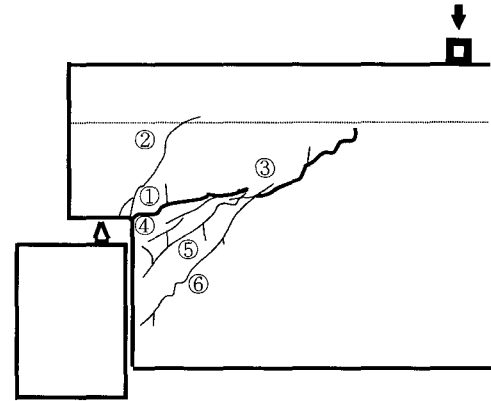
Example of shear cracking at failure stage (G-1-B)
